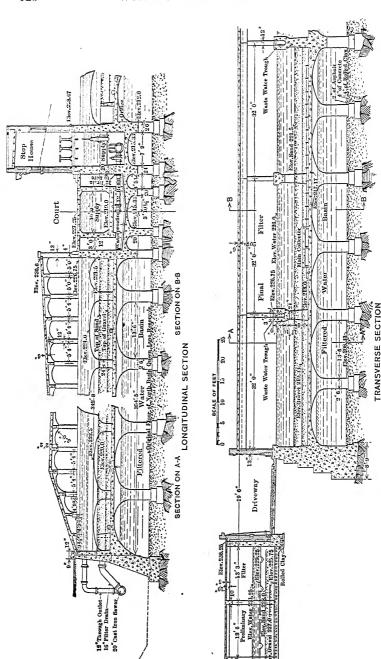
Sections through Queen Lane slow sand filters, Philadelphia.
